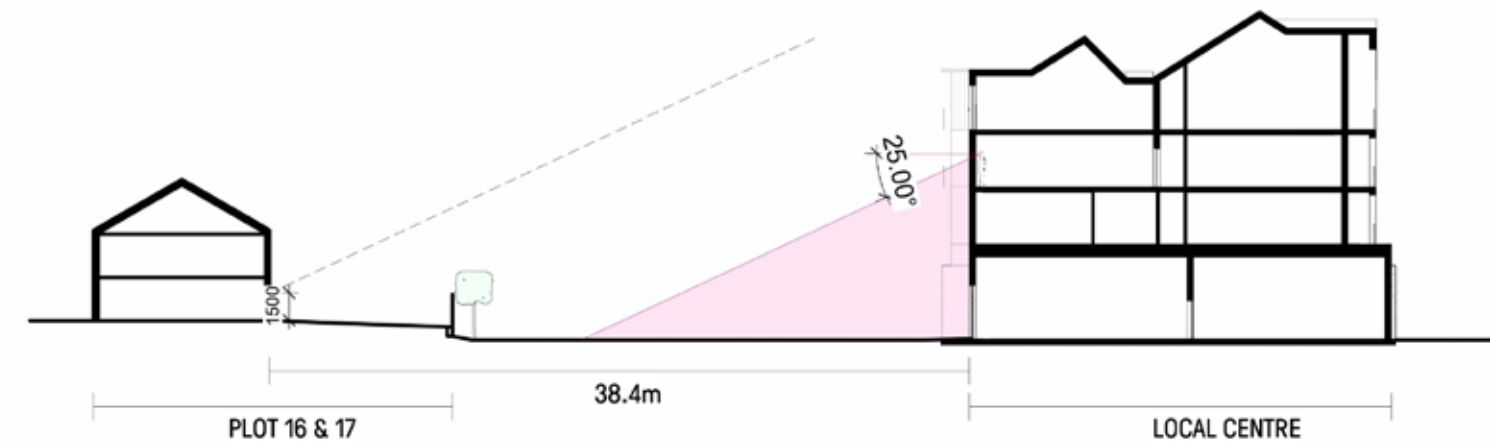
Local Centre & Plot 16 & 17 Second Floor Privacy Section prepared for Design Workshop
